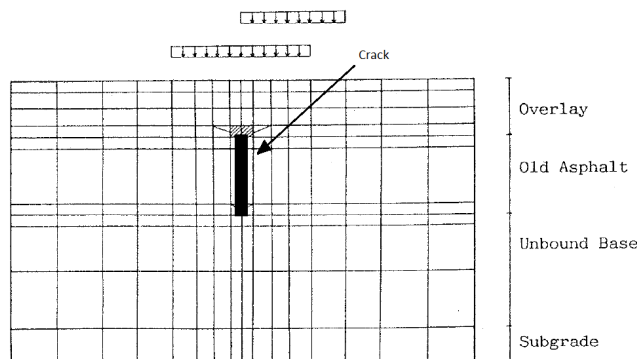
Single crack modeling in mode I and II of crack opening [3].
